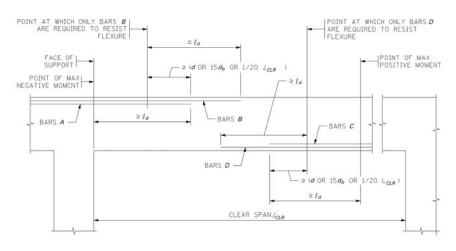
General flexural reinforcement termination requirements. Adapted from Fig. C5.10.8.1.2a-1 of the forthcoming *AASHTO LRFD Bridge Design Specifications*, 10th edition.²
